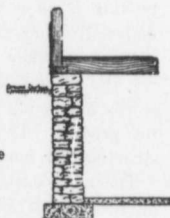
Typical dwelling house foundation—a wall of rubble masonry
